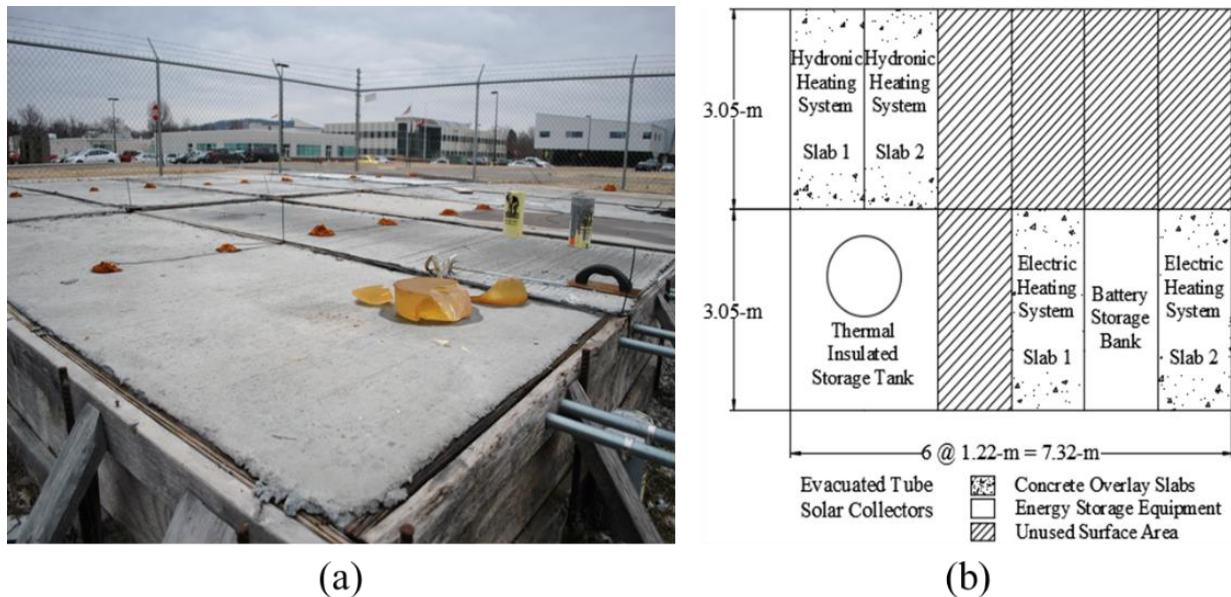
(a) existing test platform surface and (b) test layout diagram, aerial view.
